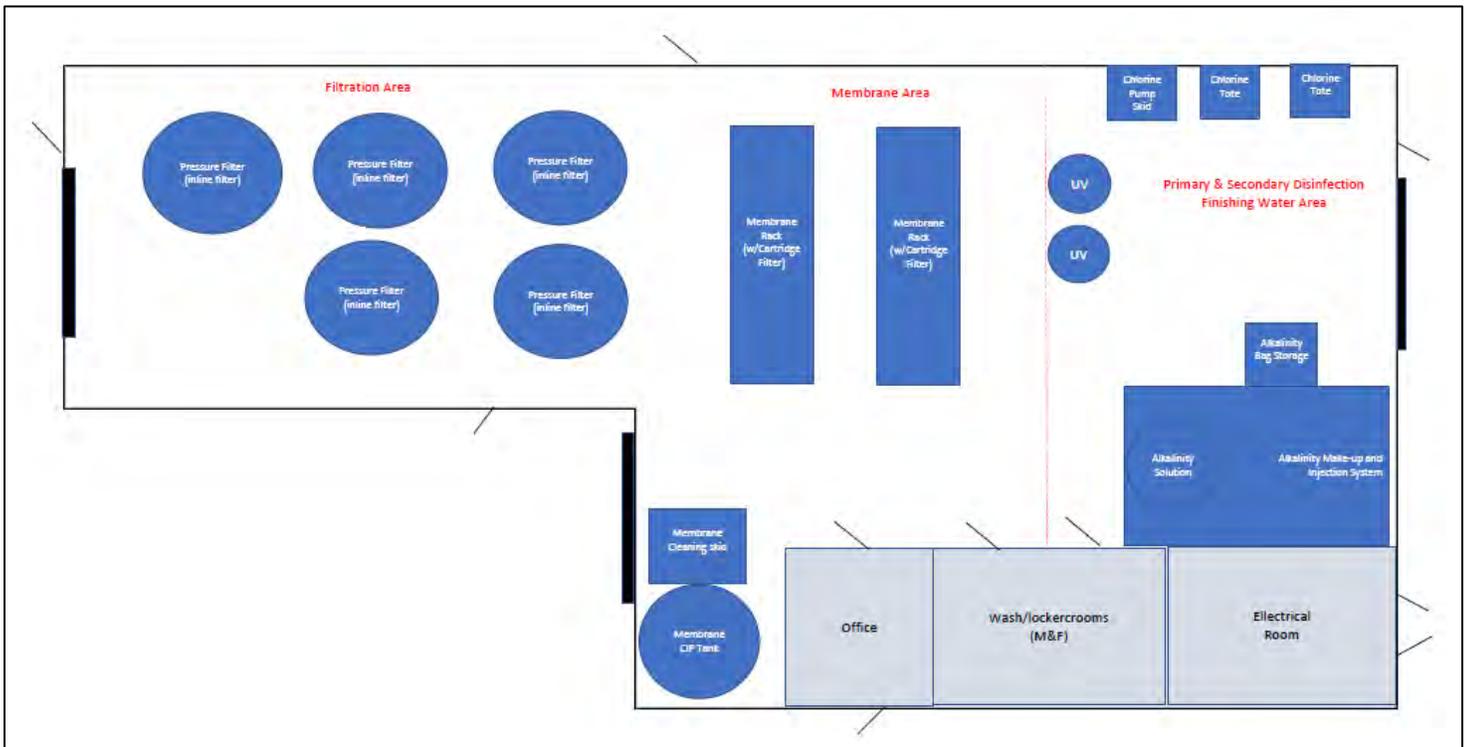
Conceptual Facility Layout – Membrane Based System
